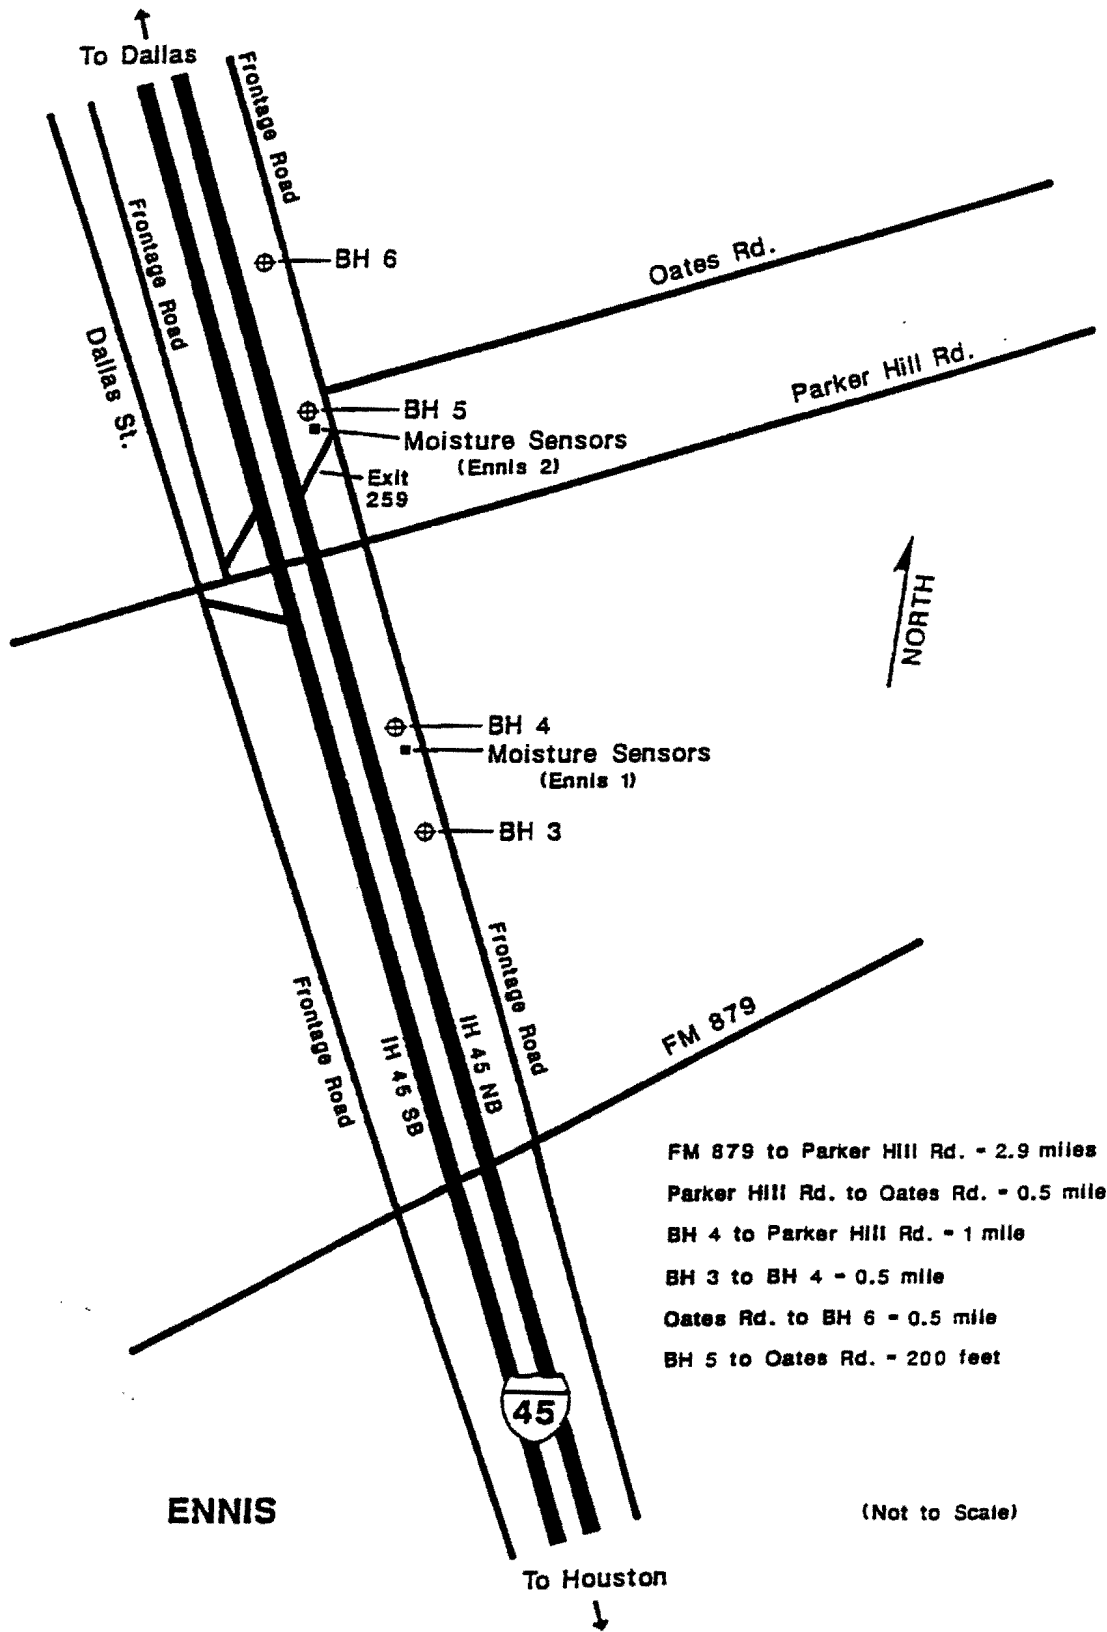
Site Plan of Test Section at Ennis, IH 45 Frontage Road
